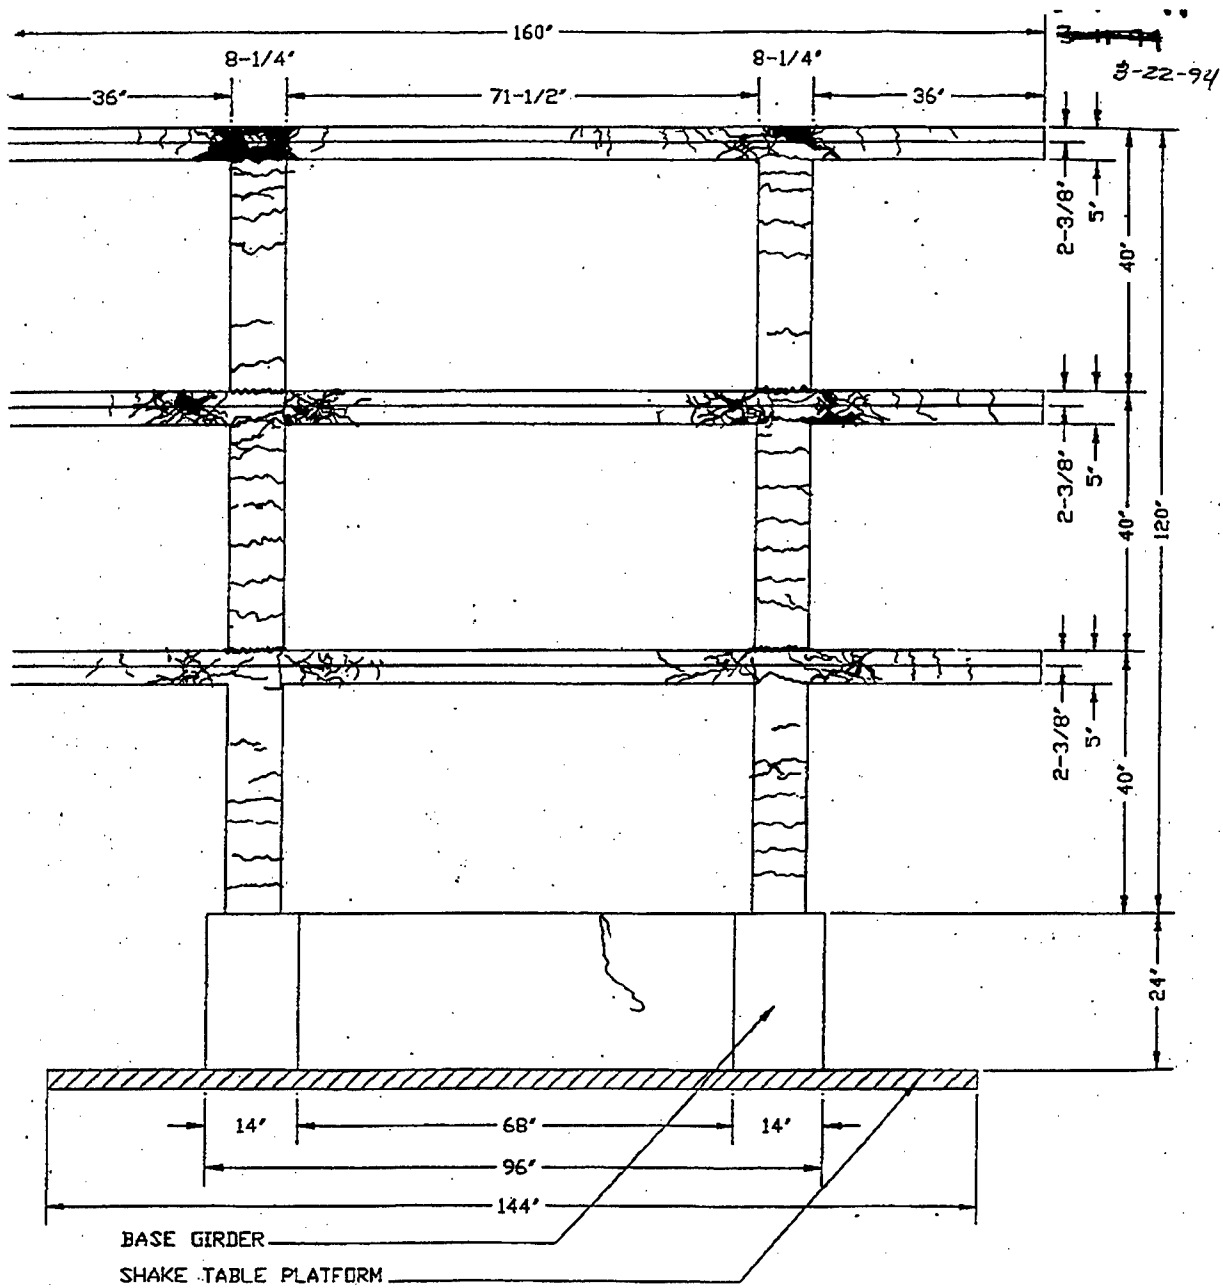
Crack Pattern, North Side of North Columns, Post-E200N
